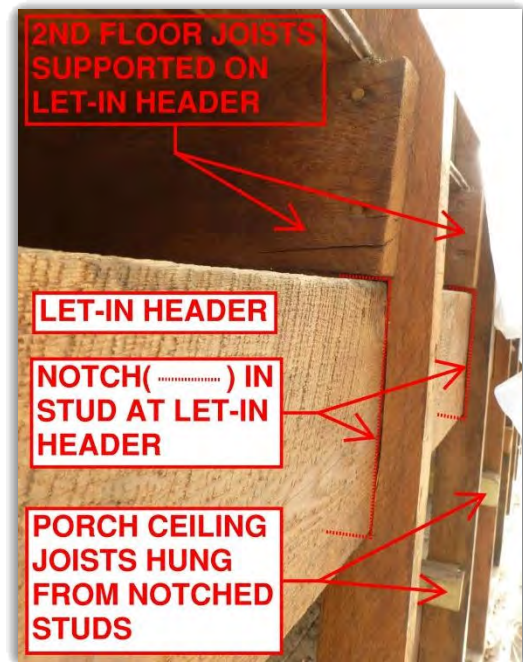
Porch Ceiling Joists Hung from Notched Studs (January 16, 2018)
